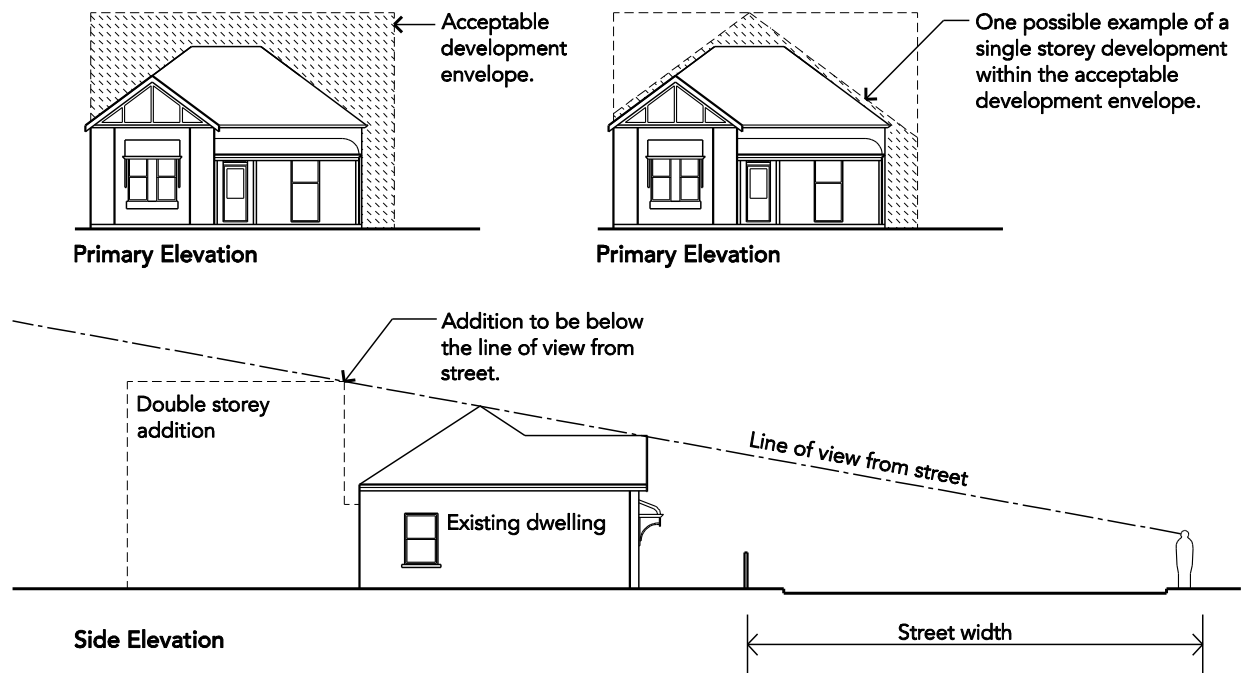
Elevations illustrating compatible alterations and additions – *Griffiths Architects 2012.
